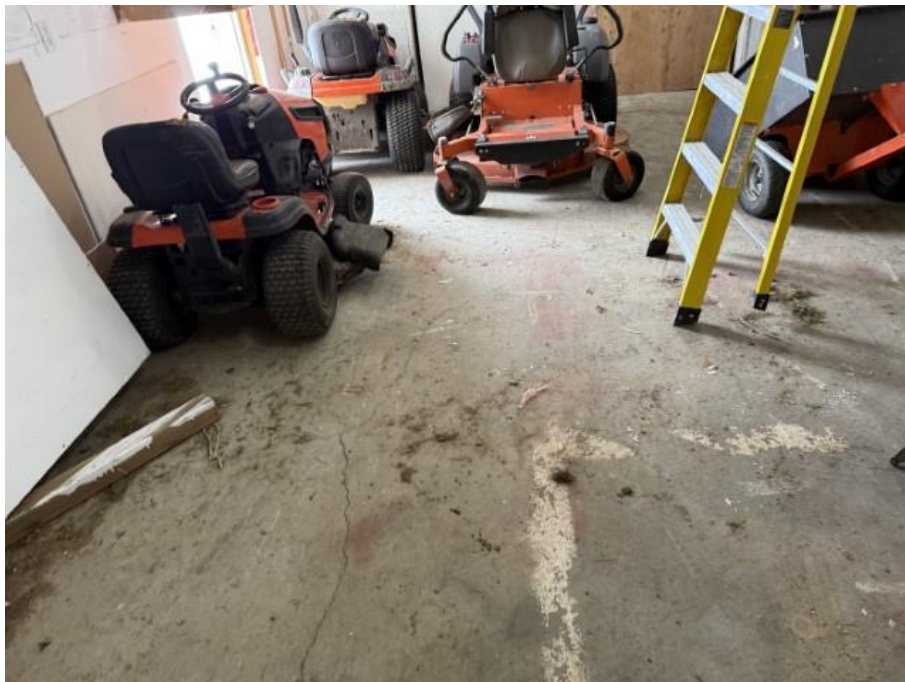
Changing/Storage Building – Overview of Slab Cracking
